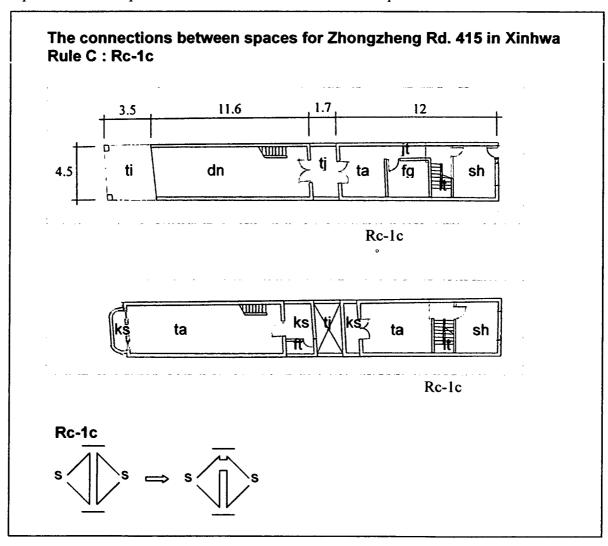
33 Rule C for illustrating openings on inner walls of floor plans at Zhongzheng Rd. 415 in Xinhwa
